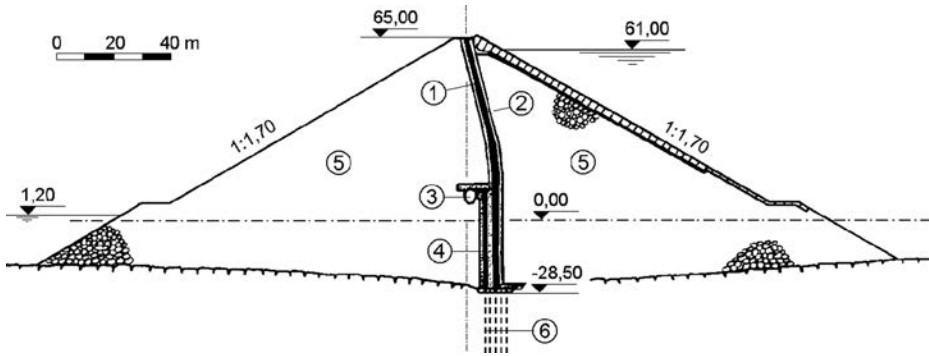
High Island (western) dam. (1) Asphaltic concrete core; (2) filter layer; (3) inspection gallery; (4) auxiliary asphaltic concrete core; (5) rockfill; (6) grout curtain.
